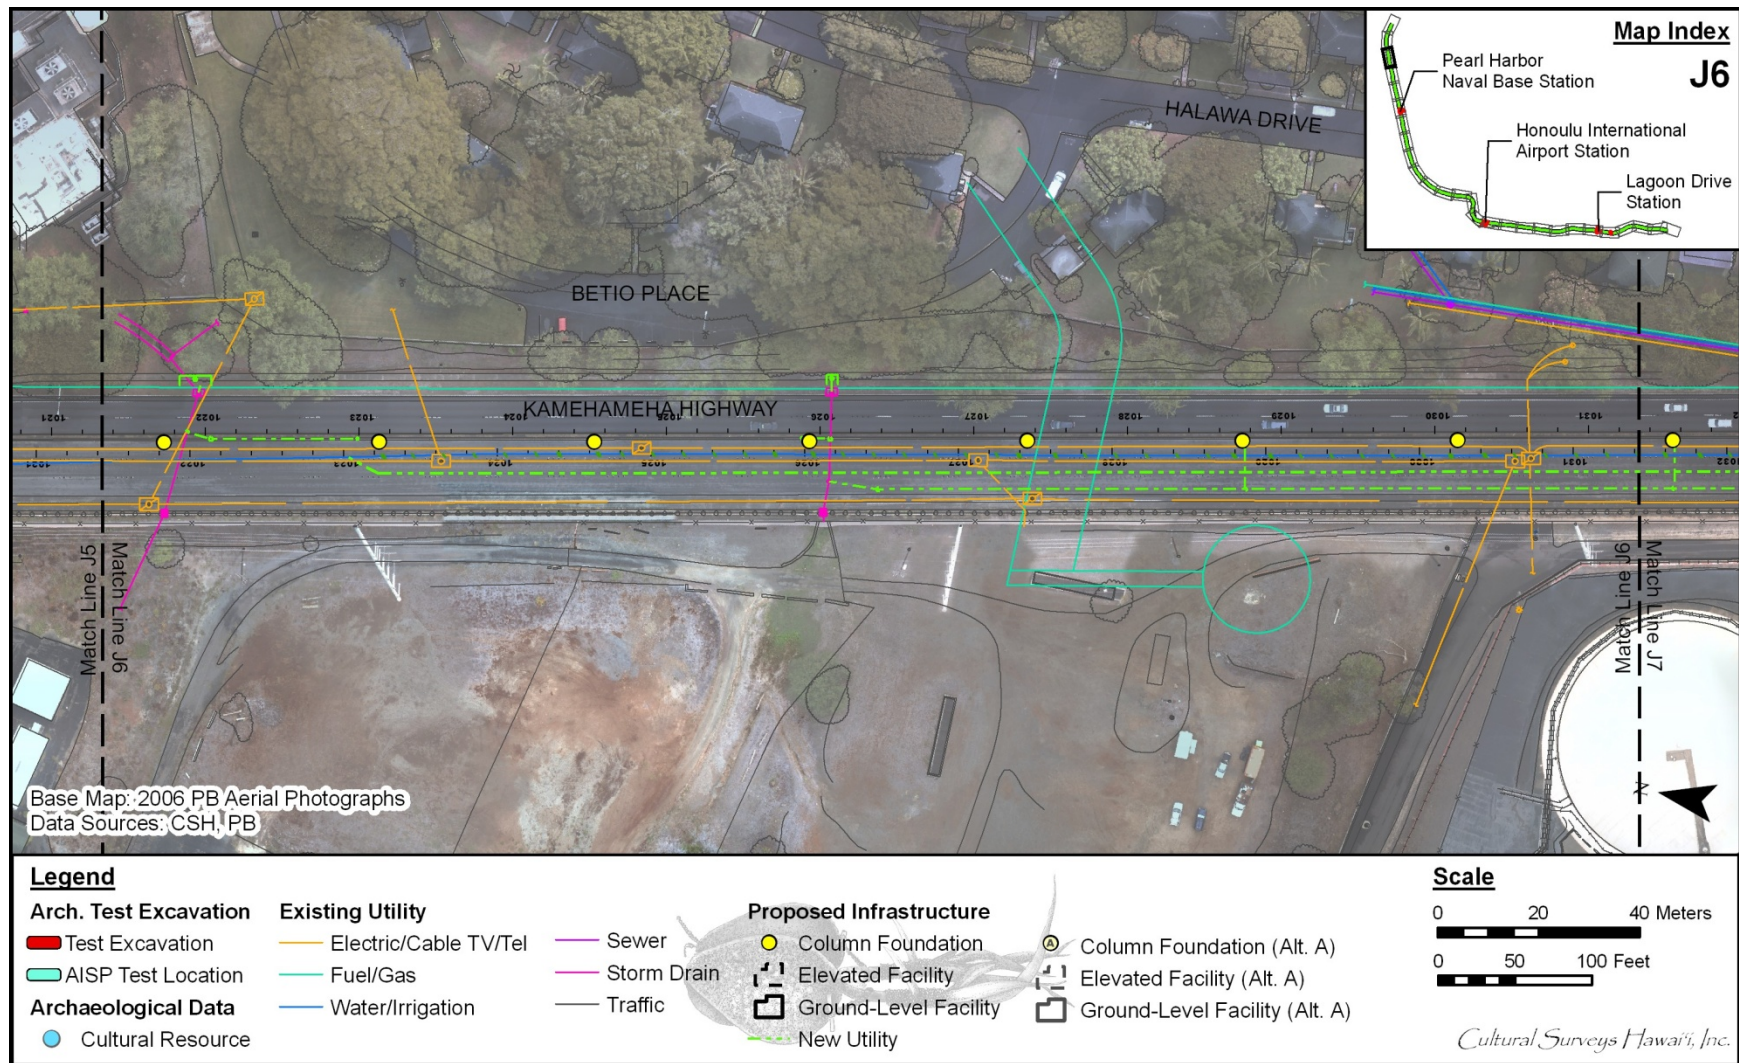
Map Sheet J6, no test excavations due to traffic constraints
